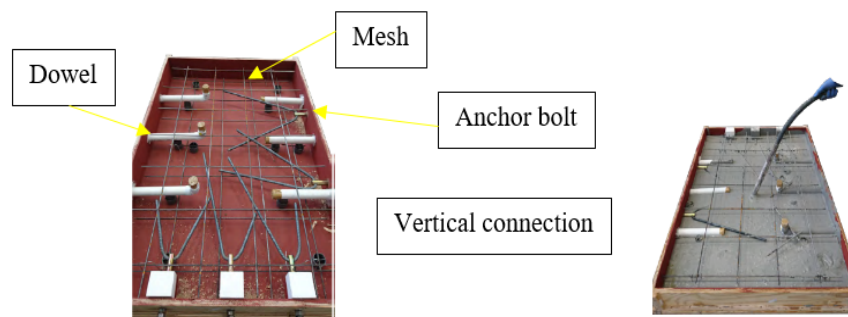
LWFC wall panel mould used showing reinforcement, vertical connection box, anchor bolts and dowel connections and during casting (Dunn, van Zijl, and van Rooyen (2018))
